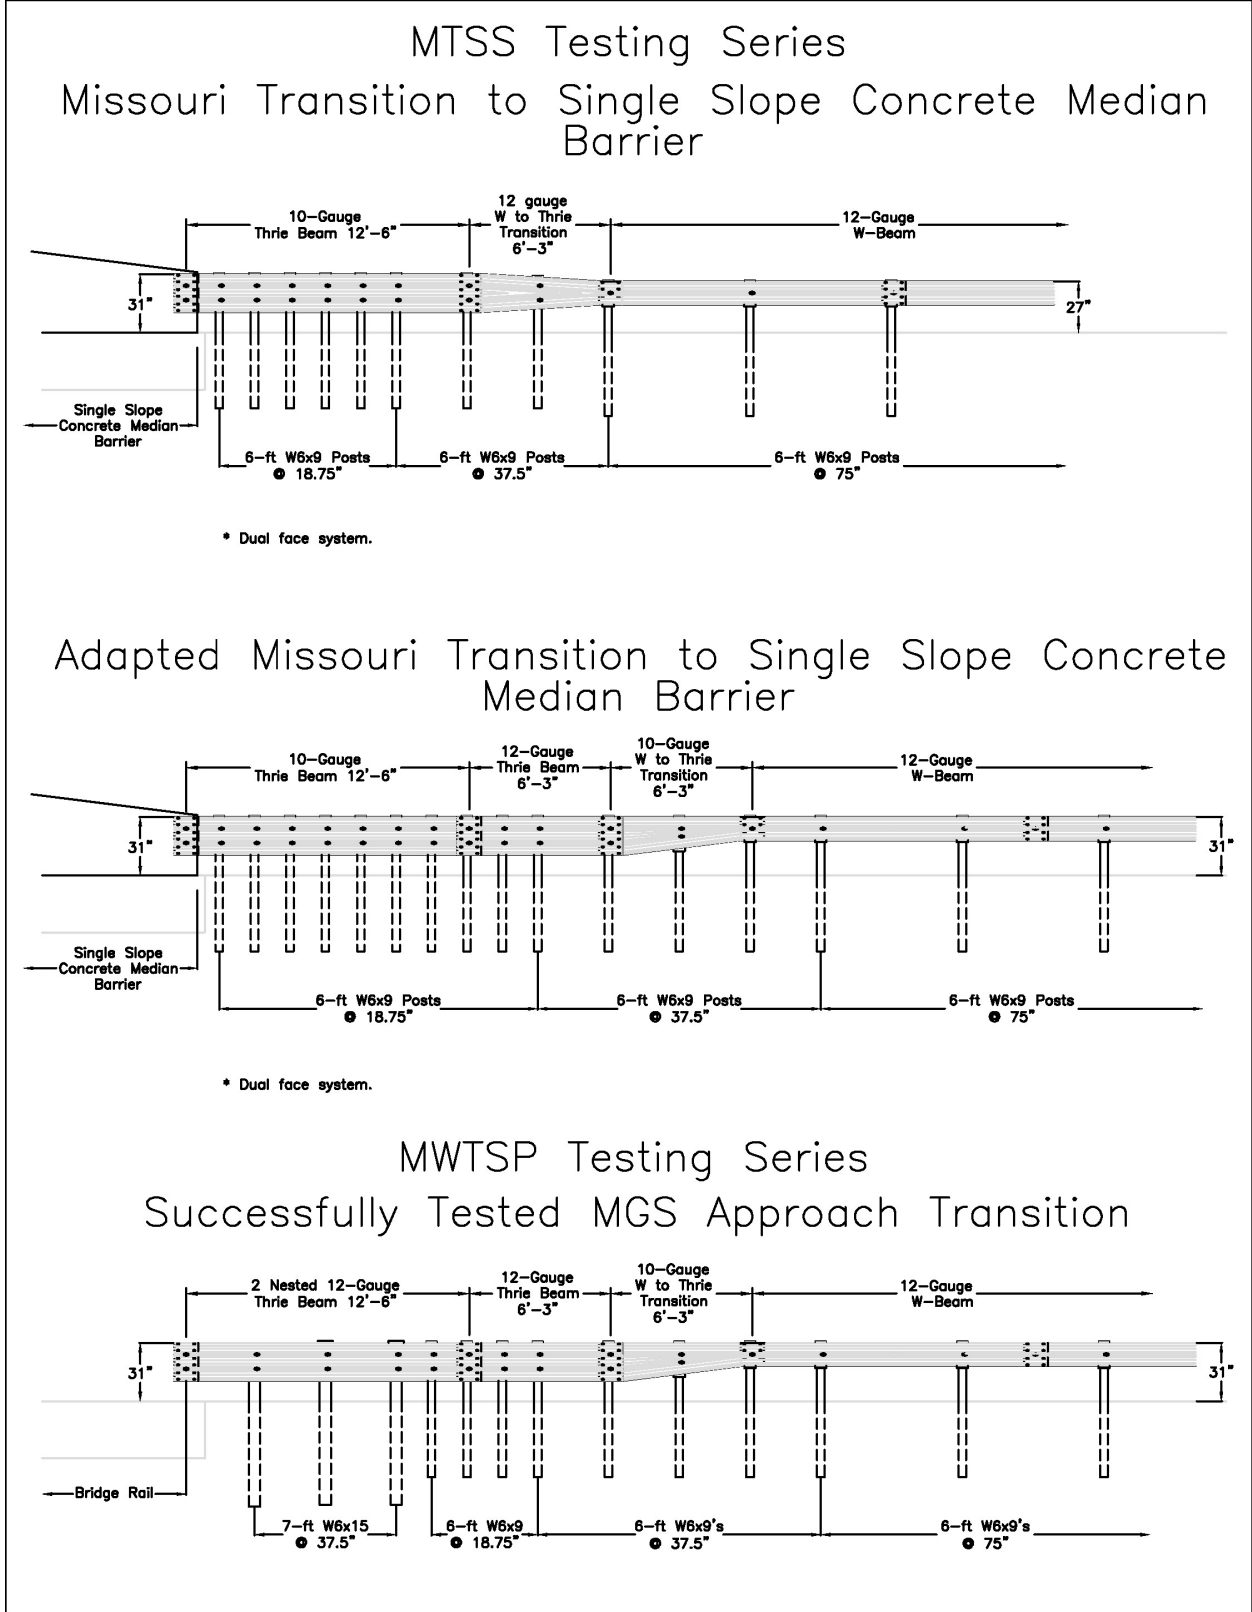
Attachment to Missouri Transition to Single Slope Parapet, MTSS Testing Series [32-33]
